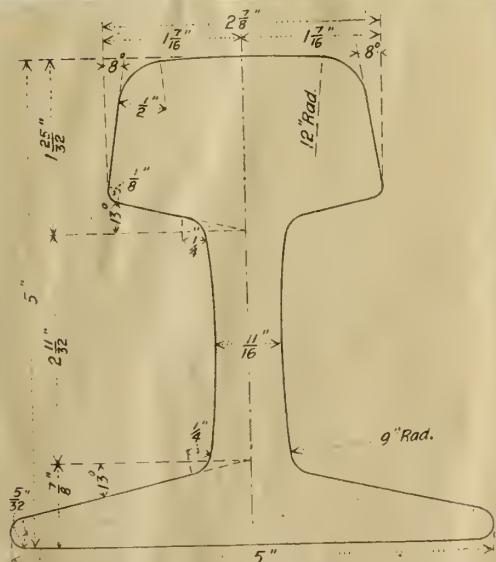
Cross Section of 90-lb. Rail for Chicago & South Side Elevated Railway.
